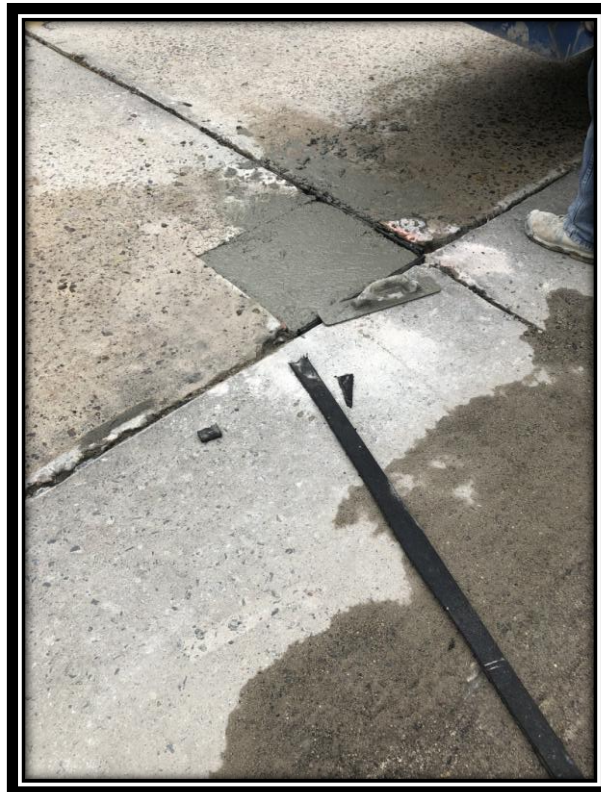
Installation of partial depth concrete slab repair along the southbound lane between Turnersville - Hickstown Road and Bromley Drive
